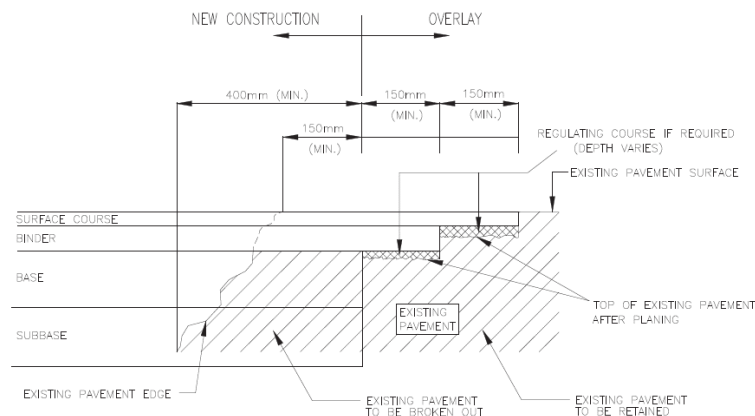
Longitudinal Joint between new construction and existing road as per CC-SCD-00704-02
